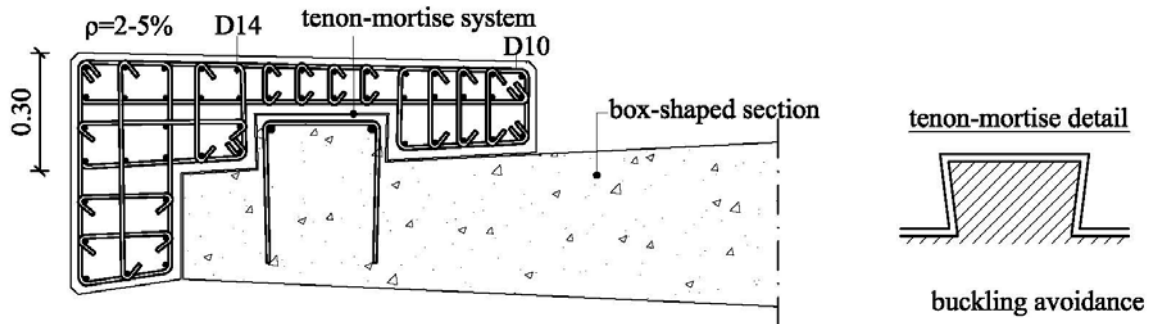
Proposing reinforcement detailing of the sidewalks
